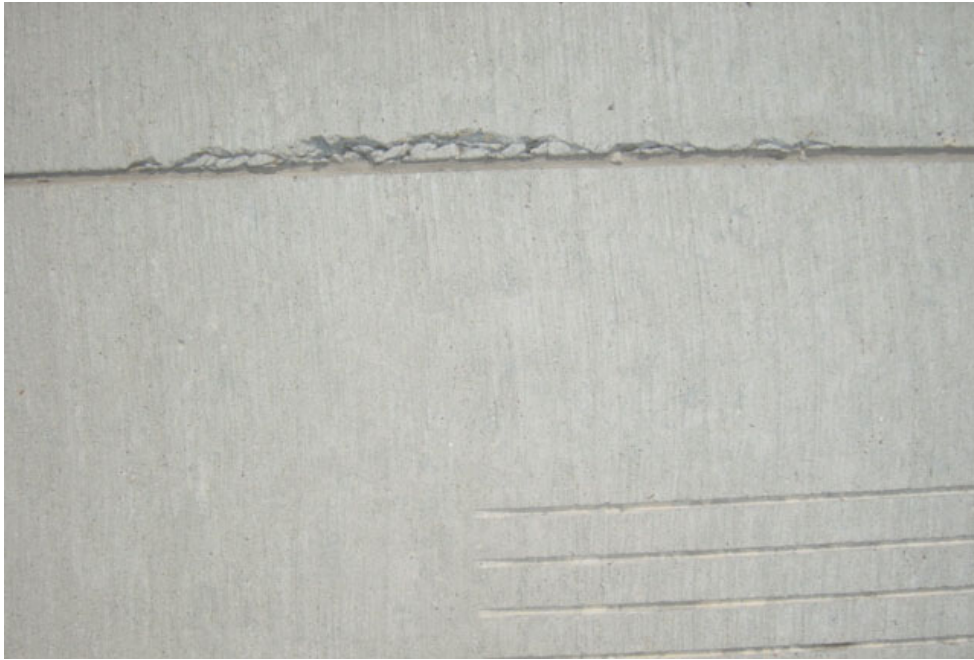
Runway 9-27, Feature R1A, low-severity spalling joint
